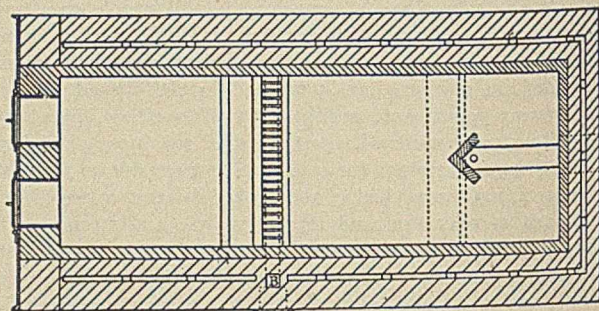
HORIZONTAL SECTION THROUGH BOILER SETTING
